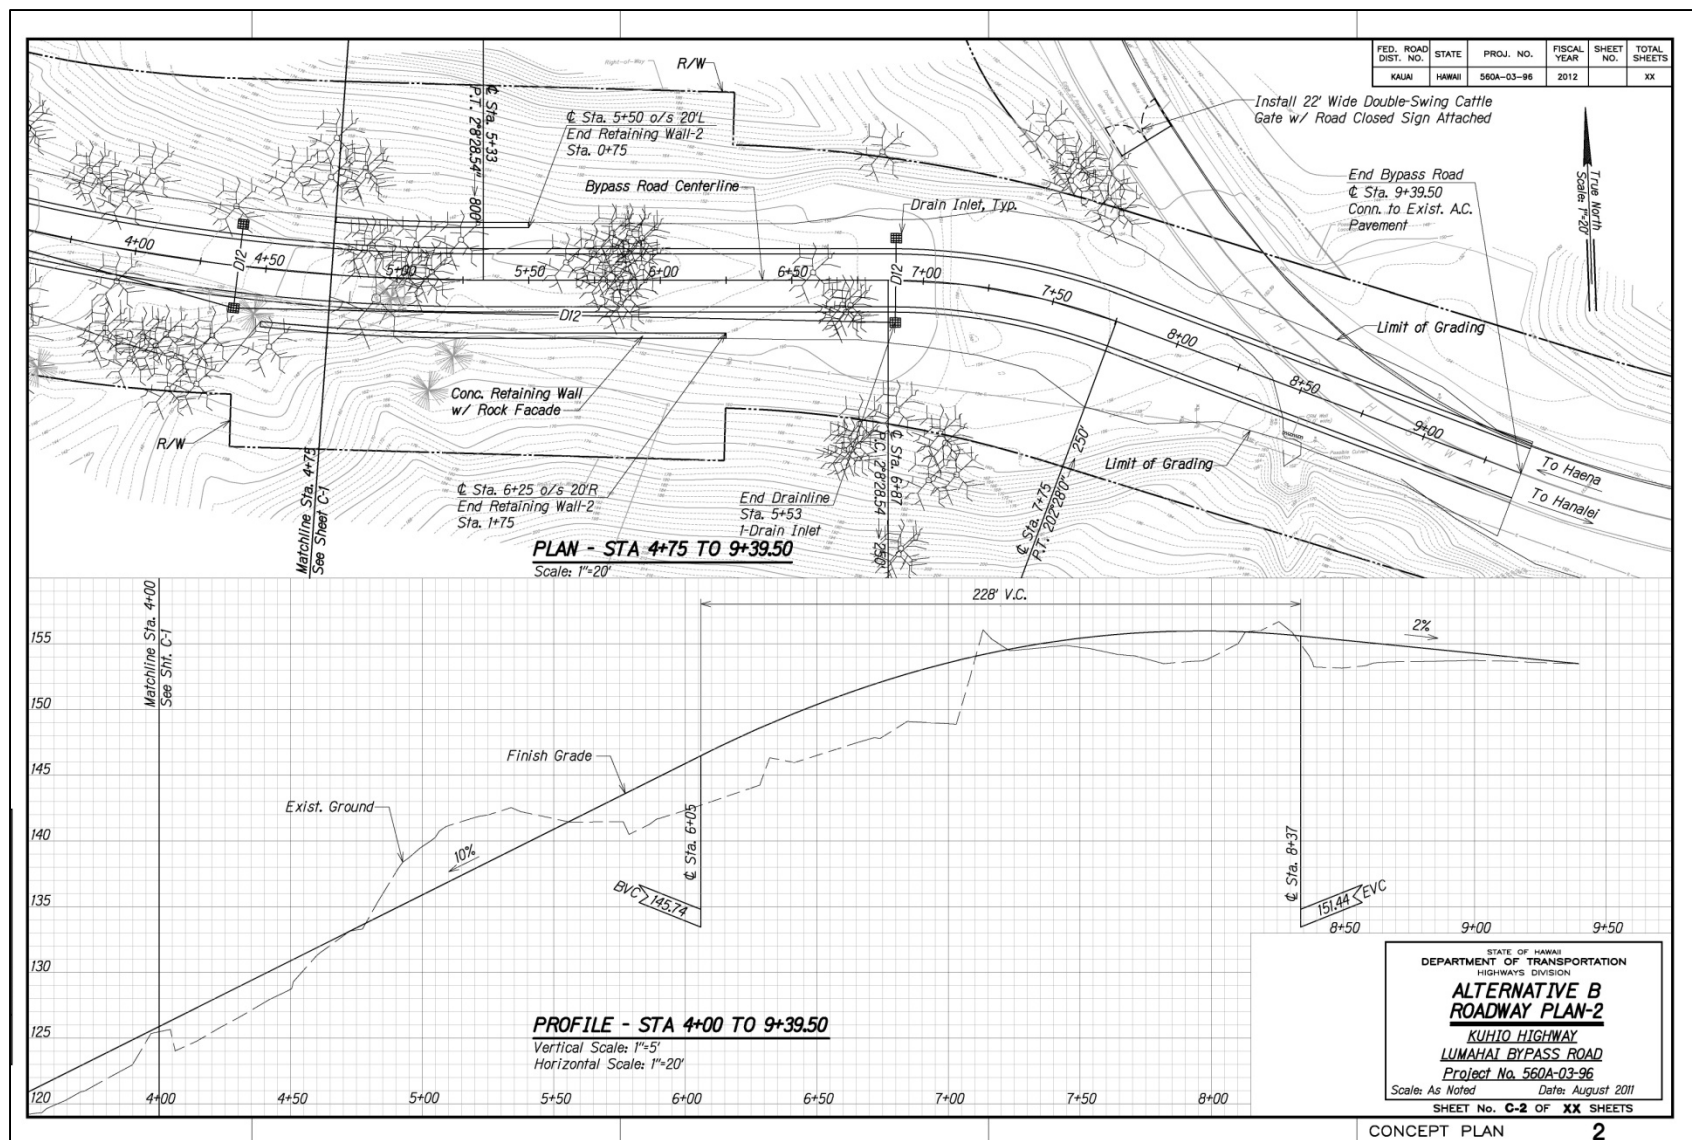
Plan for the proposed Bypass Road Corridor (Plan 2).
